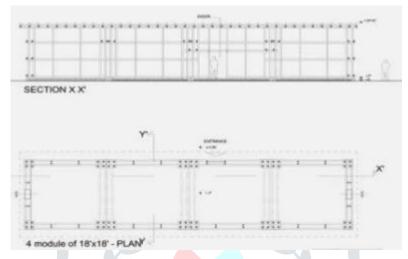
Plan of the shelter Showing Future Extensions and Insulations Source: www.mhscitylab.org
